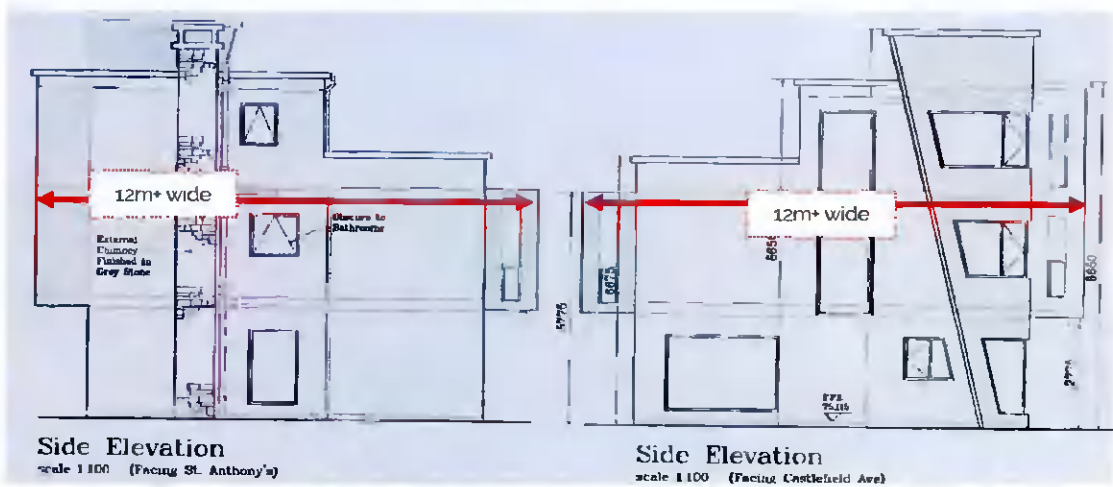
The odd, over-scaled, bulky, and heavily massed appearance of the side elevations
